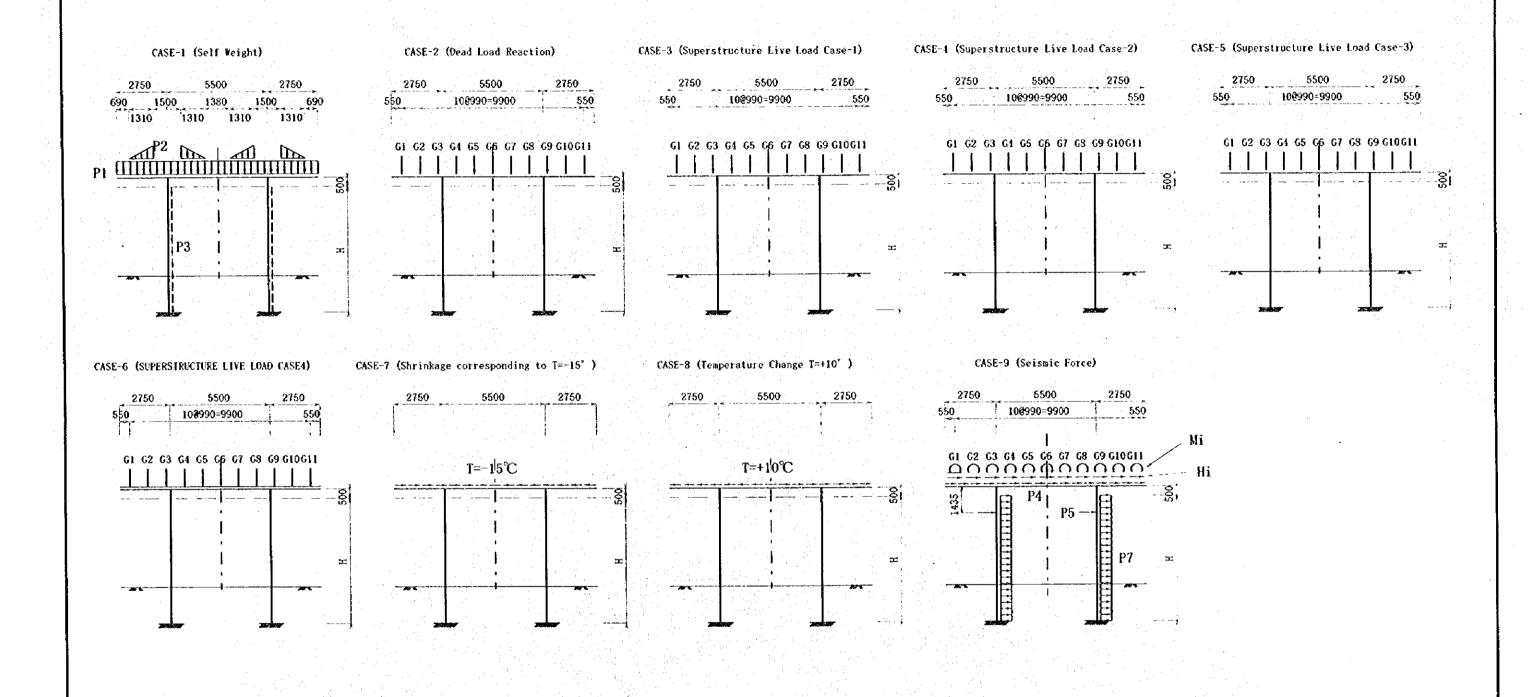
General Loading Diagram for Rigid Framed Pier in Transversal Direction
